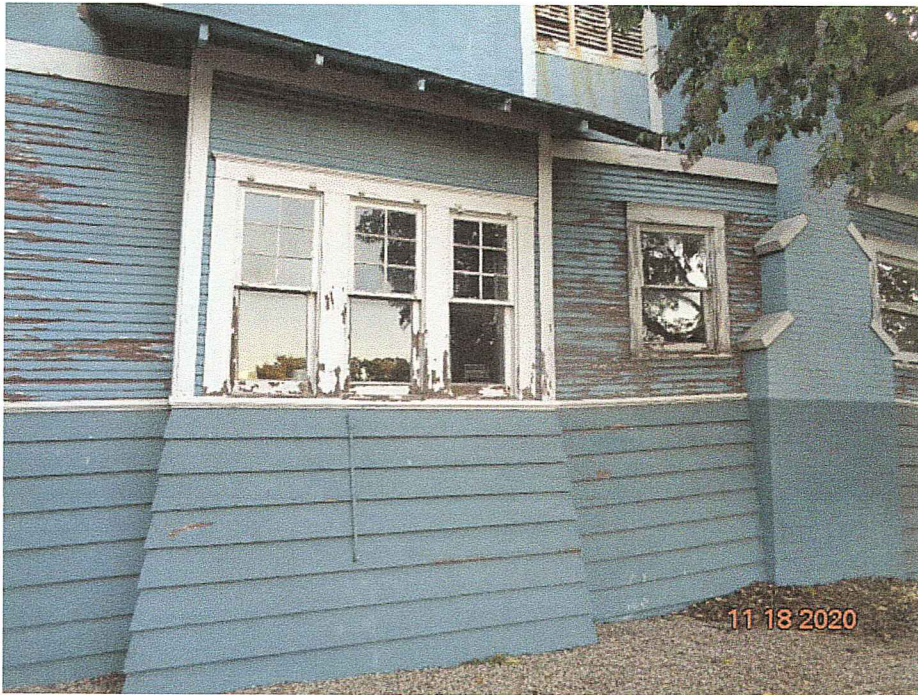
view looking northward at section of southern exterior wall framing and door frame out of square near southeast corner of structure
